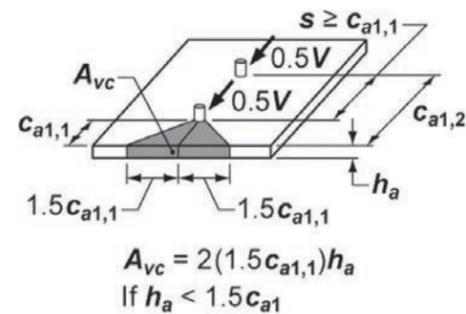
ACI-Fig. R17.5.2.1b—Calculation of A_{vc} for single anchors and groups of anchors per ACI 318-14..
